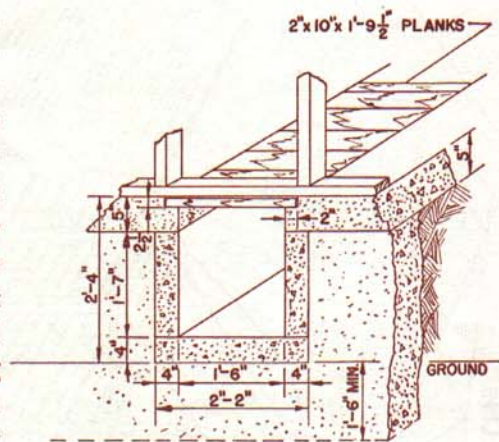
Construction of gutters with removable covers for the drying crib shown in Fig. 9.
